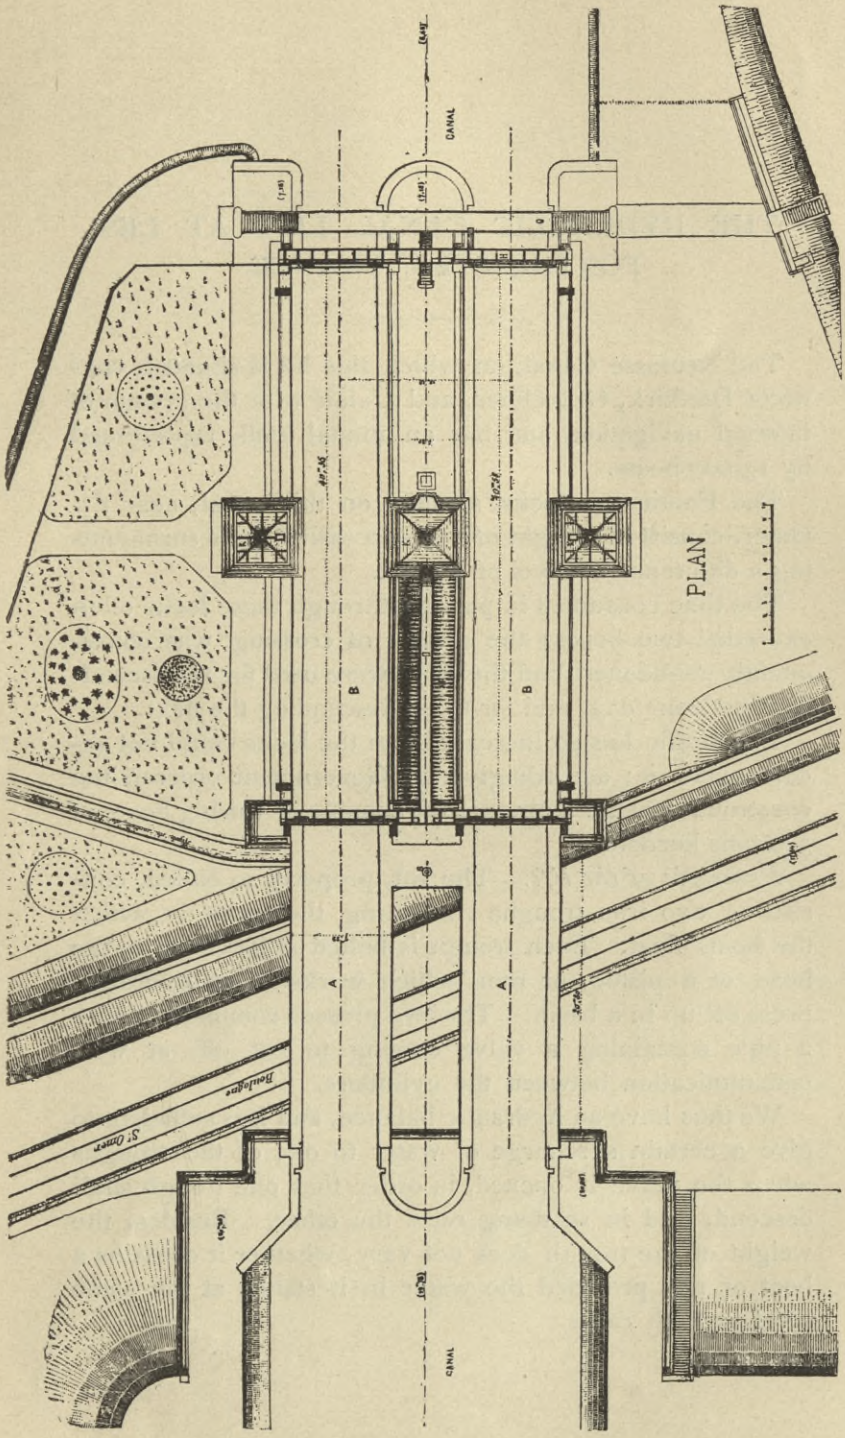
Plan of the hydraulic lift at Les Fontinettes. A A, canal bridge with two separate lines or branches crossing the railroad from Boulogne to St. Omer; B B, movable troughs; H H, frames supporting the gates; K K, towers; L, lookout cabin; M, machine house; Q, service bridge; S, capstan.
